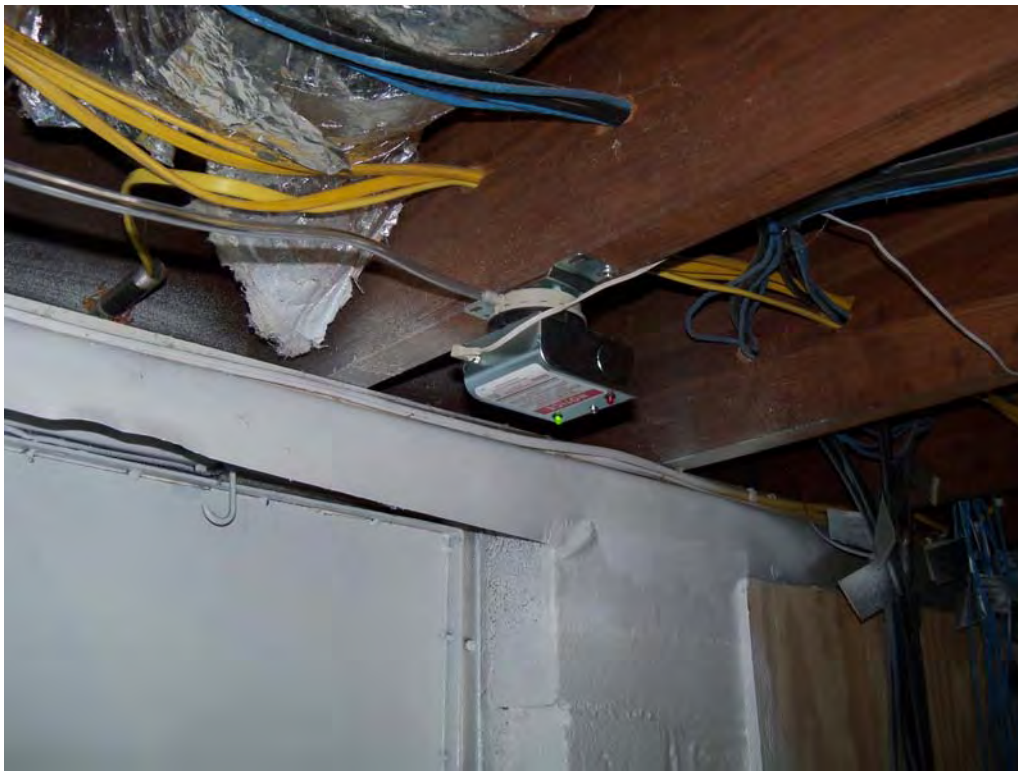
VM system alarm mounted on joist along west wall of basement, note clear plastic tube connecting to VM system header pipe
